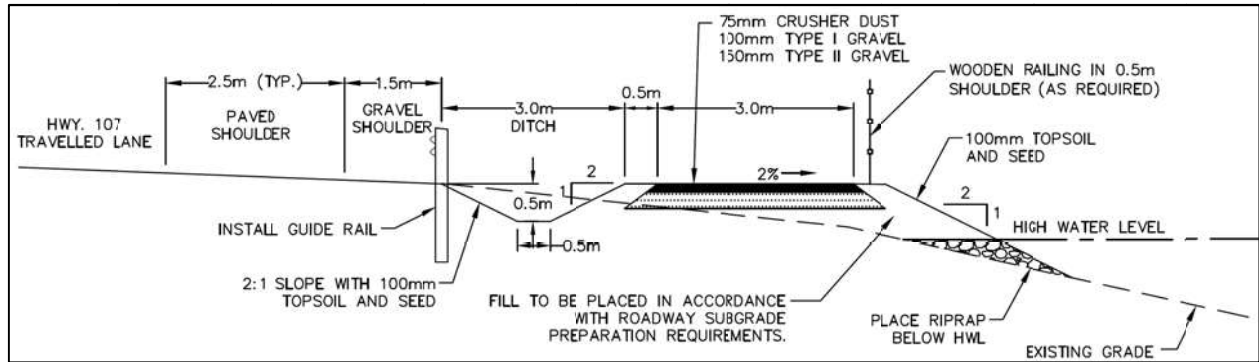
Typical Greenway Cross Section with Moderate Separation from Highway
